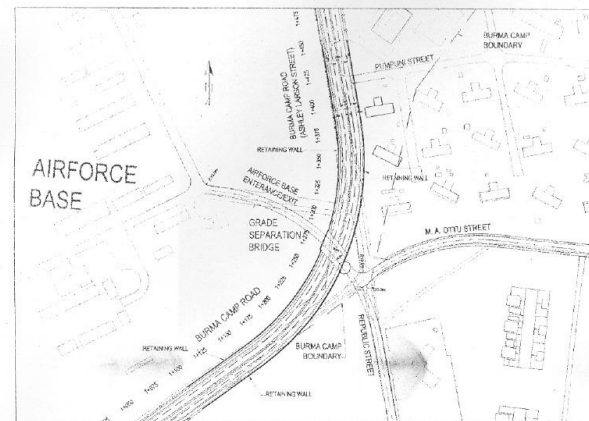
Burma Camp/Republic/M. A. Ottu Street Intersection
